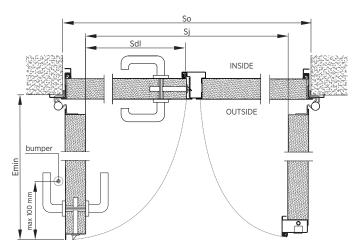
Installation of a double-leaf door in front of the opening – corner frame without a thermal break – horizontal cross-section
